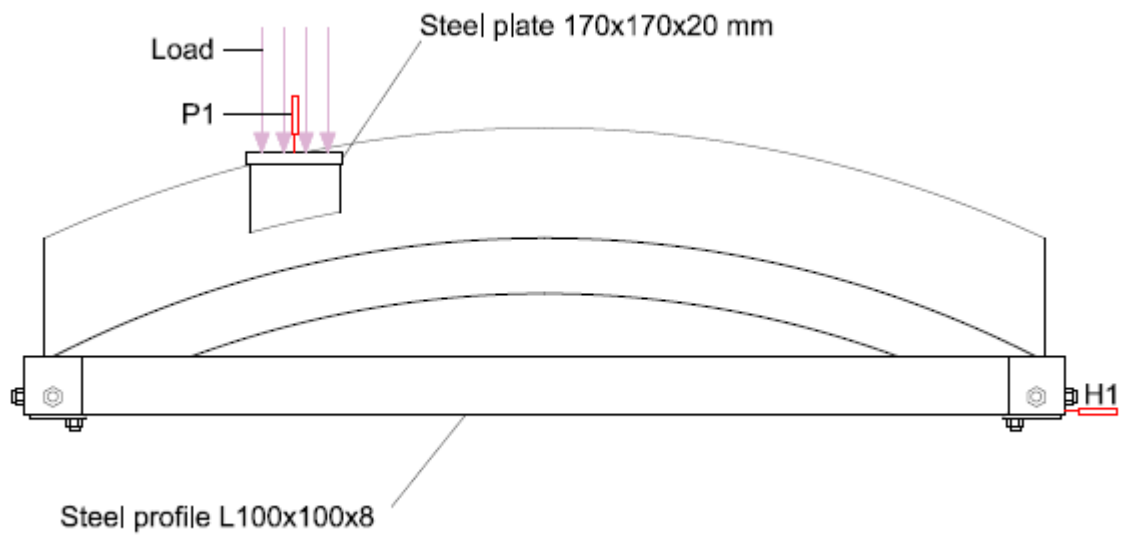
Composite sail dome prototype elevation geometry (David Lopez)
